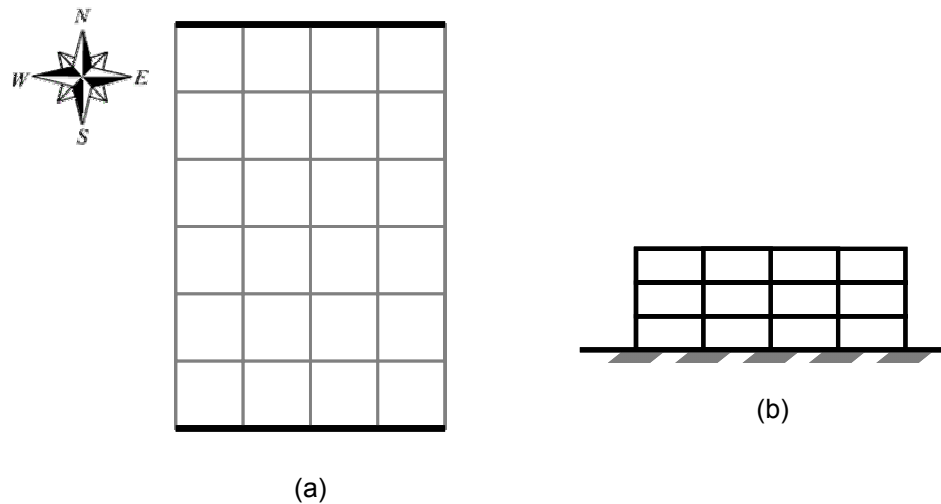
General Building Configuration with (a) Plan View showing Moment-Resisting Frames, and (b) Elevation View of a Moment-Resisting Frame
